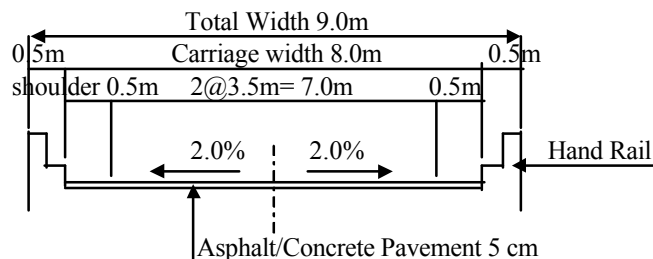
Proposed Standard Cross Section of Bridge
